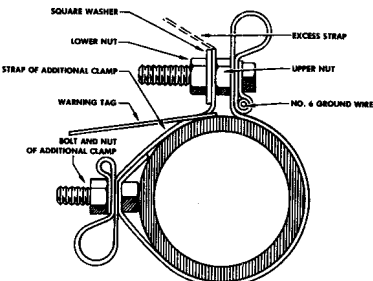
Attaching L Ground Clamp to Pipes Larger than 3 Inches
